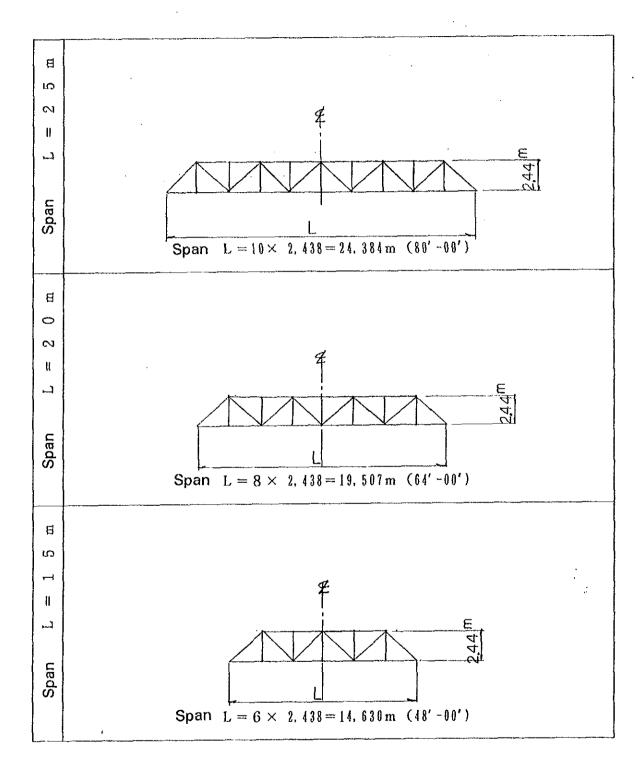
SPAN TYPE OF PORTABLE STEEL BRIDGE
